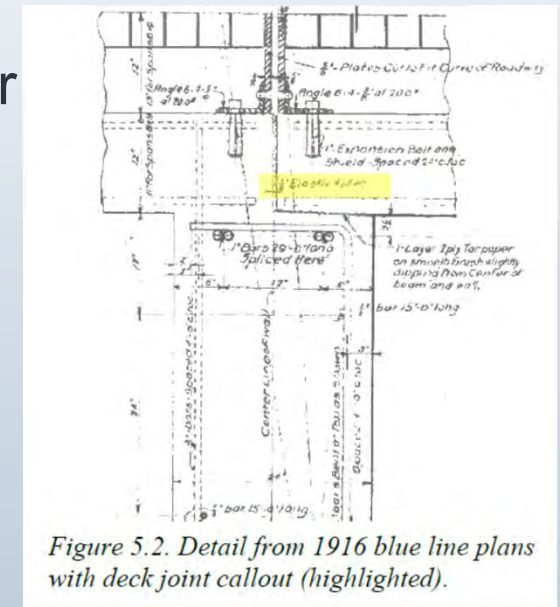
Detail from 1916 blue line plans with deck joint callout (highlighted).
